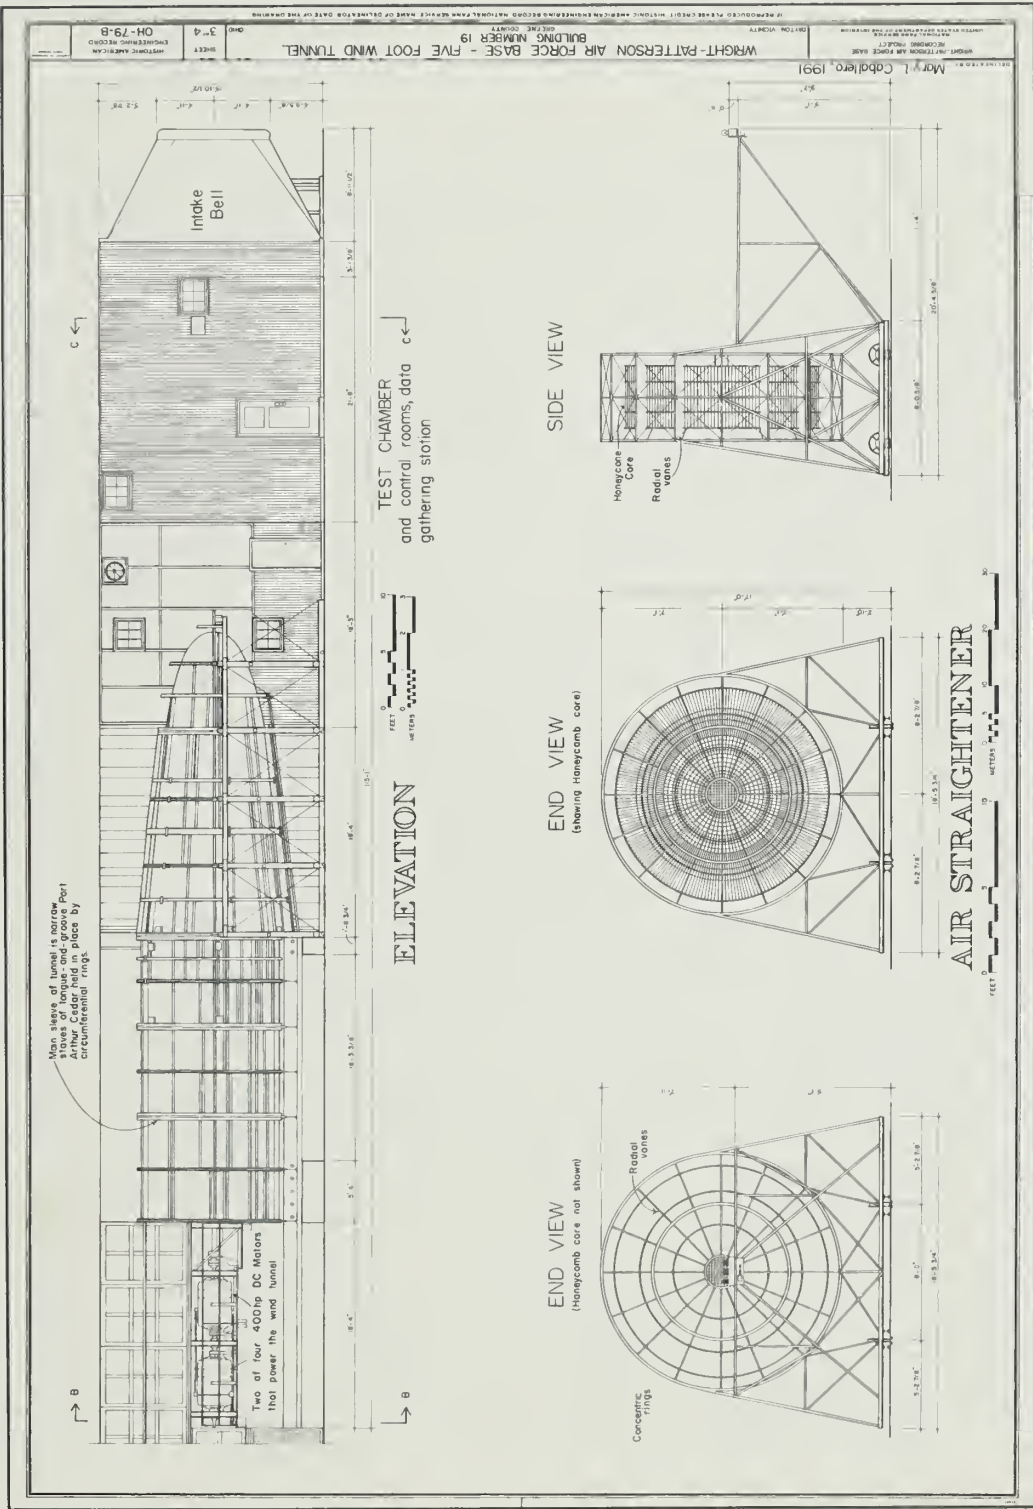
5-Foot Wind Tunnel, Building 19. (Delineated by Elaine G. Pierce, HAER, 1991)
